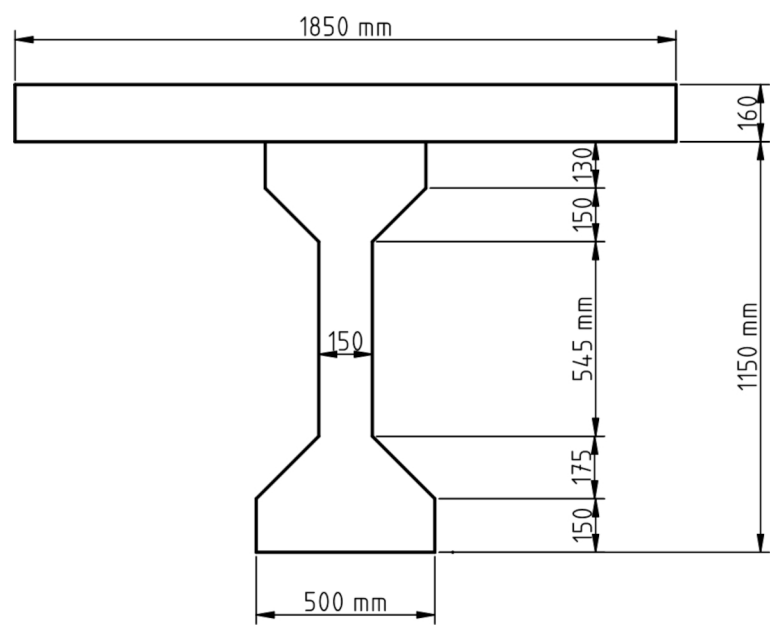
Cross-section of the precast I-girder with cast in-situ deck slab
